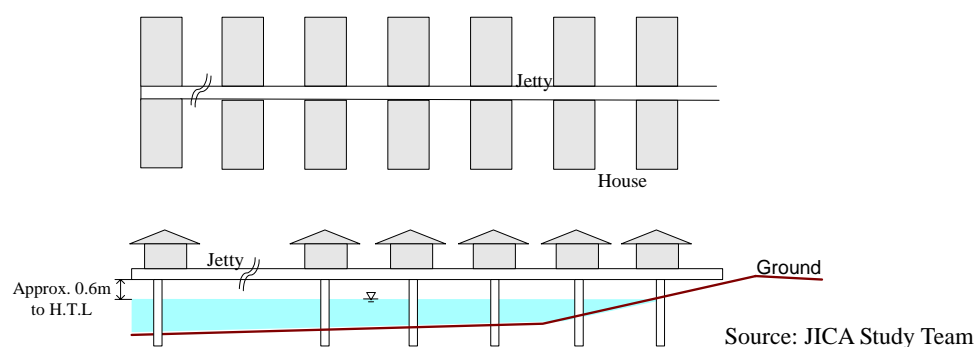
Water Village Schematic Depiction Plan and Section
